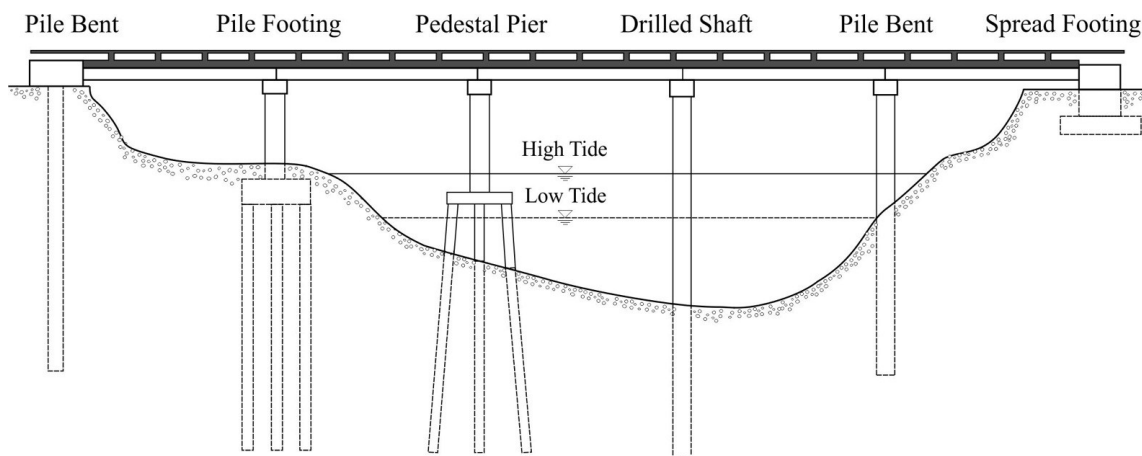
Type of bridge foundation (Chen and Duan, 2000)
